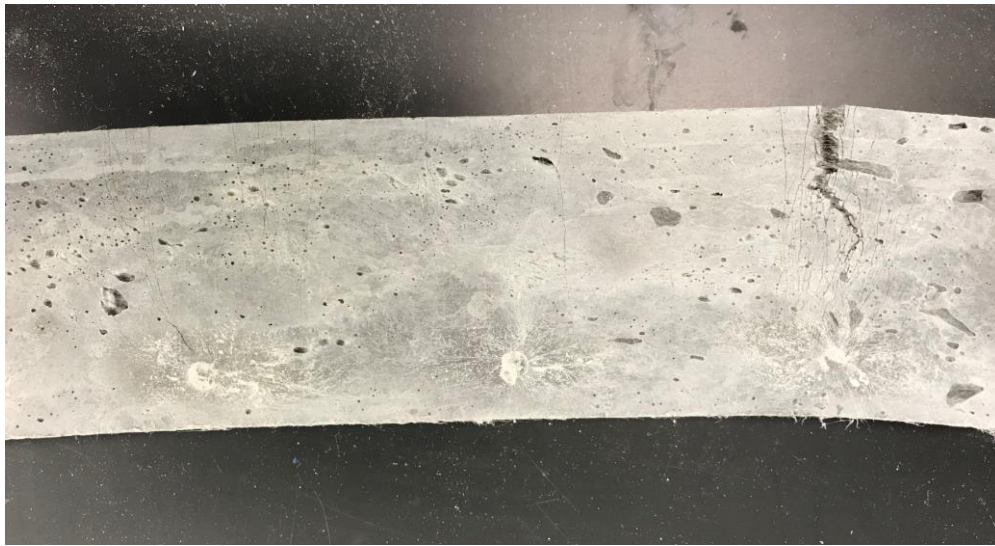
Close-up front view of final failure region in casted prismatic beam (Specimen PE-2)
